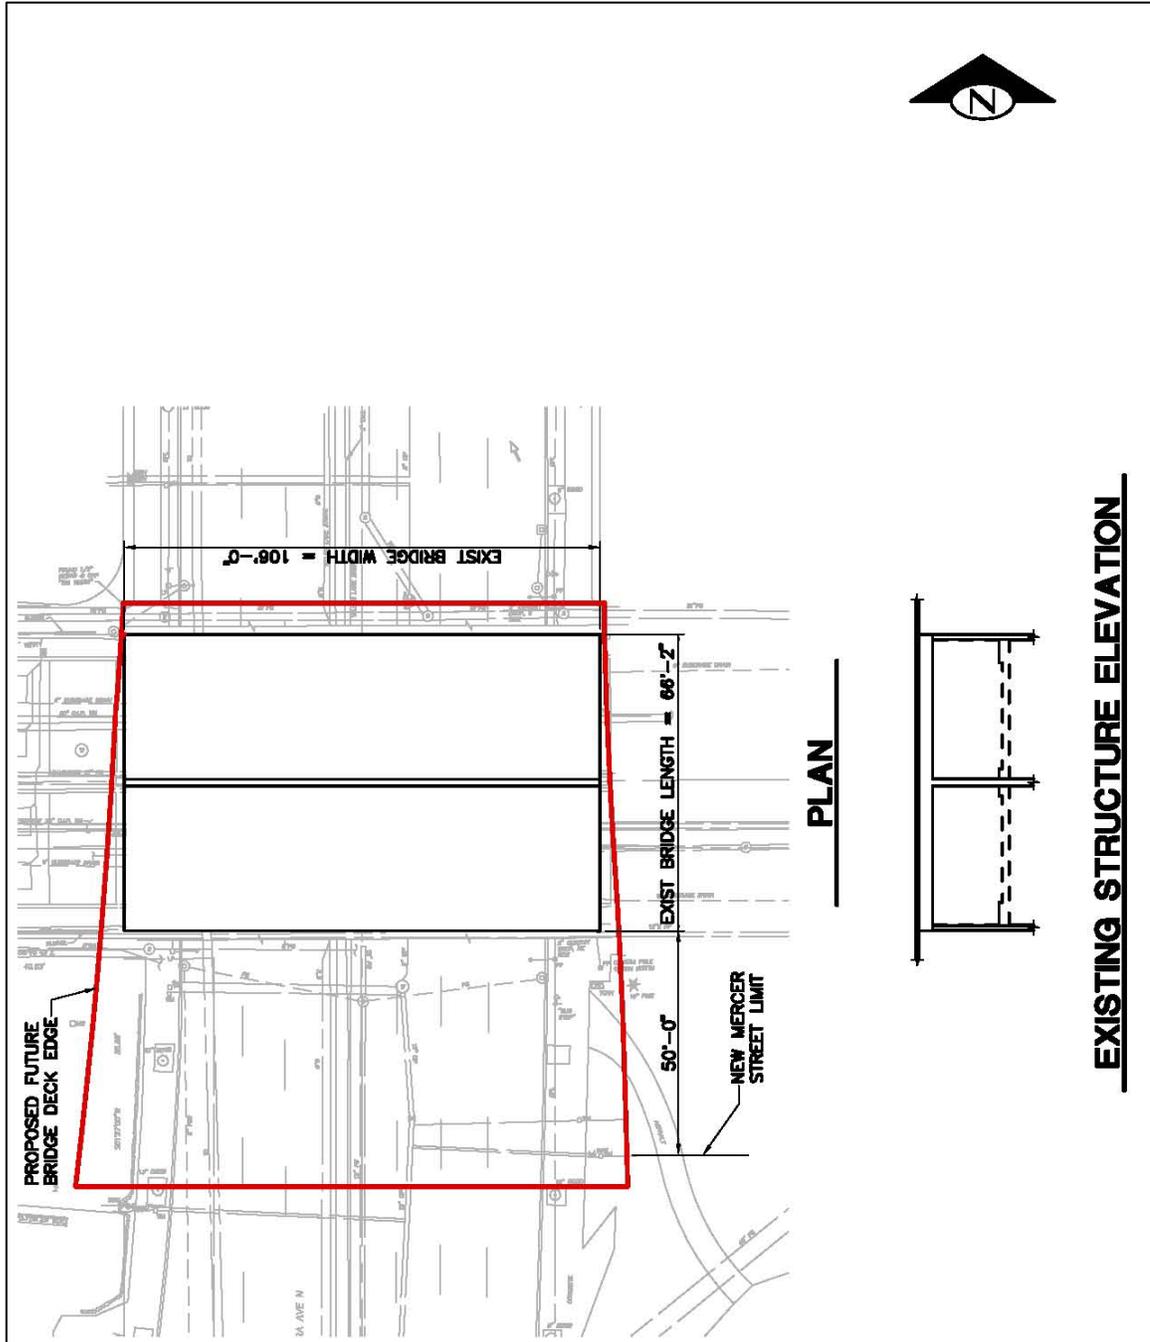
Existing and proposed SR 99 bridge over Mercer Street
